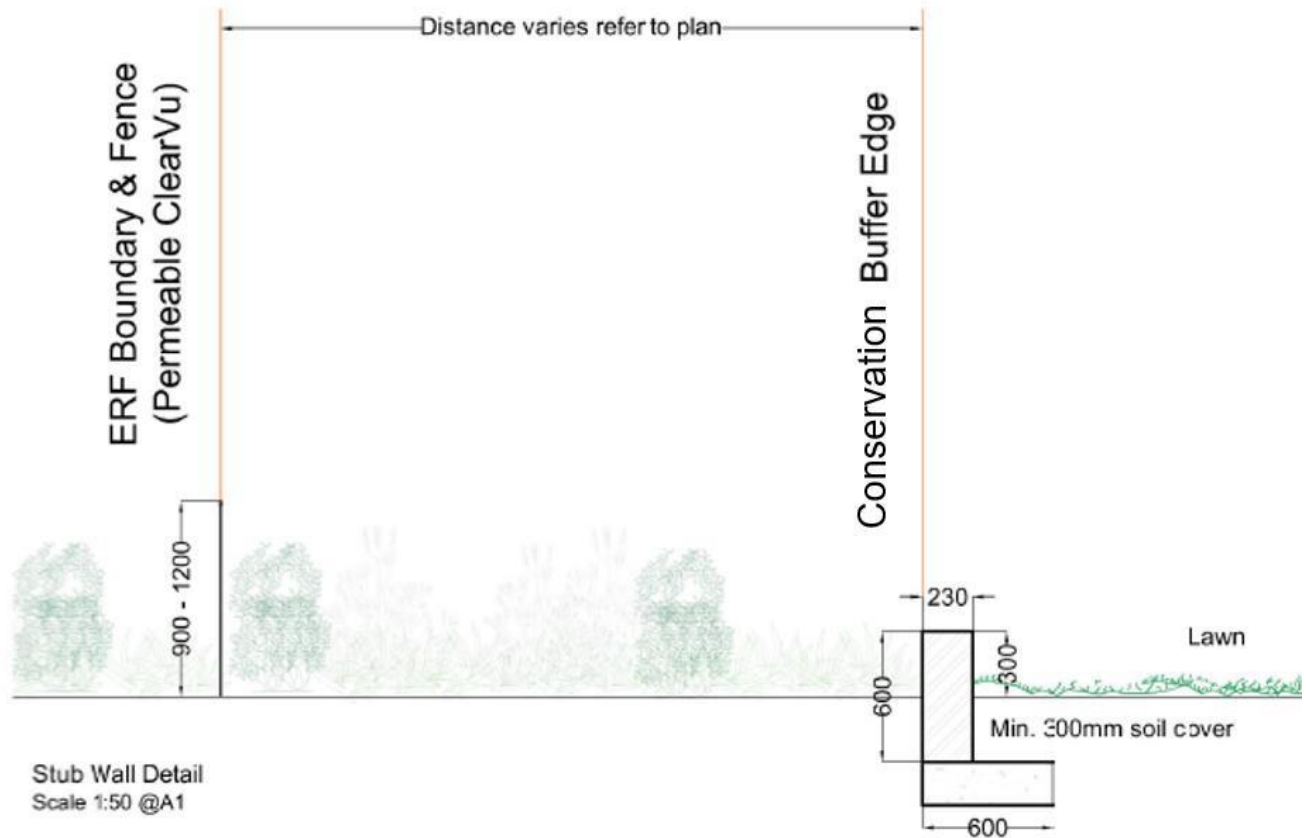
Schematic design of the proposed stub wall, as provided by Viridian Consulting (2021)
